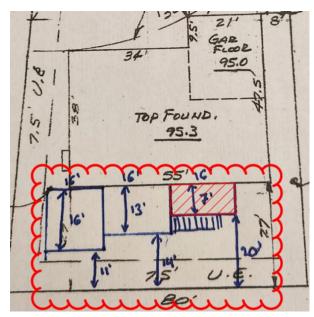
Plot plan showing proposed partially covered replacement deck. Covered portion shown with hatching.
